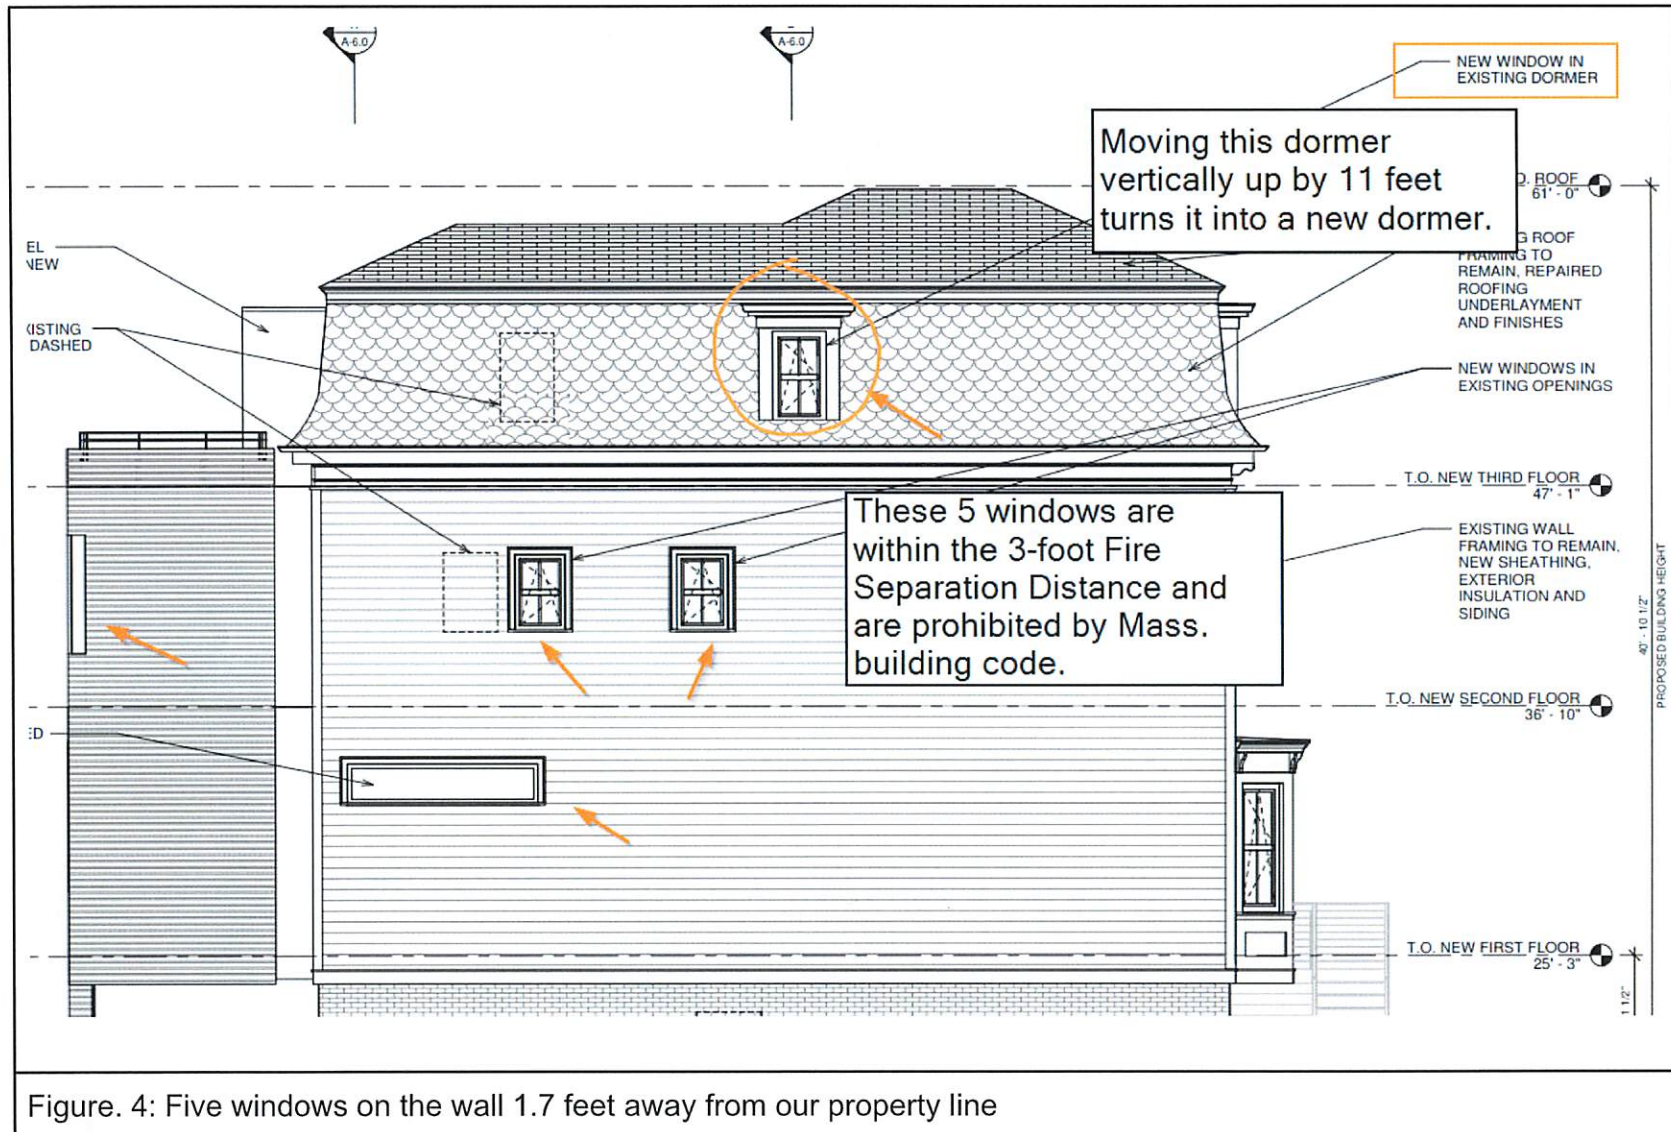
Five windows on the wall 1.7 feet away from our property line
